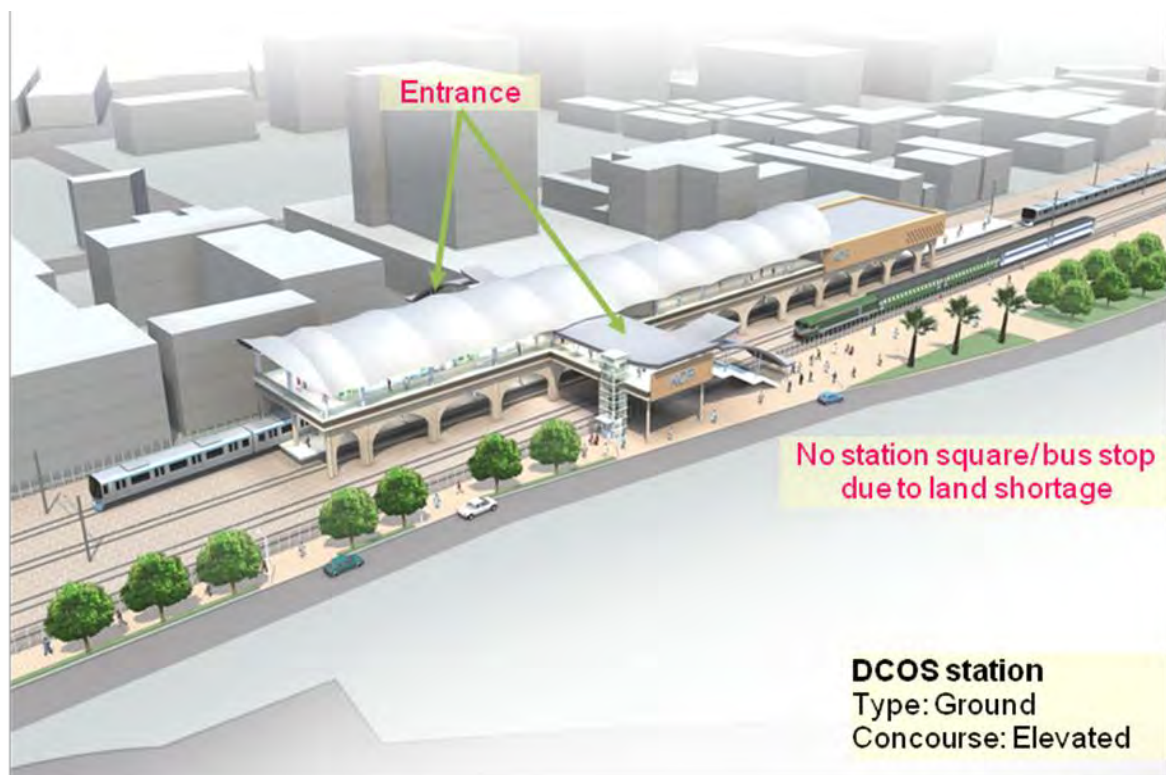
Provisional Station Plaza Plan (11/15)
